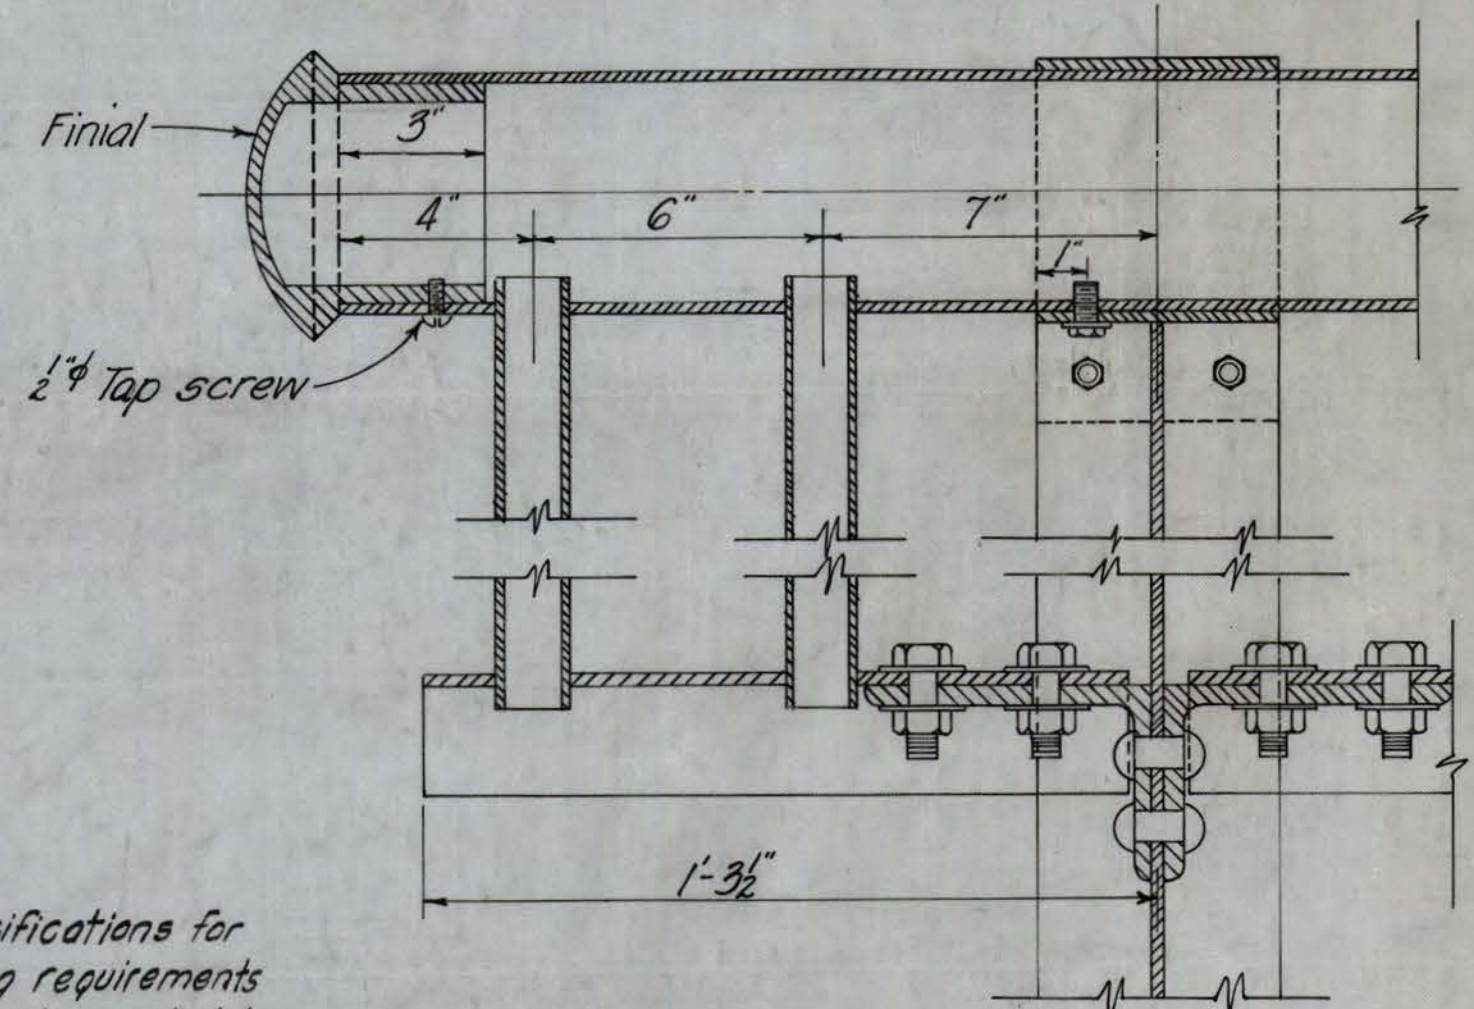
DETAILS OF SPECIAL RAILING PANELS AT PIER VIII
